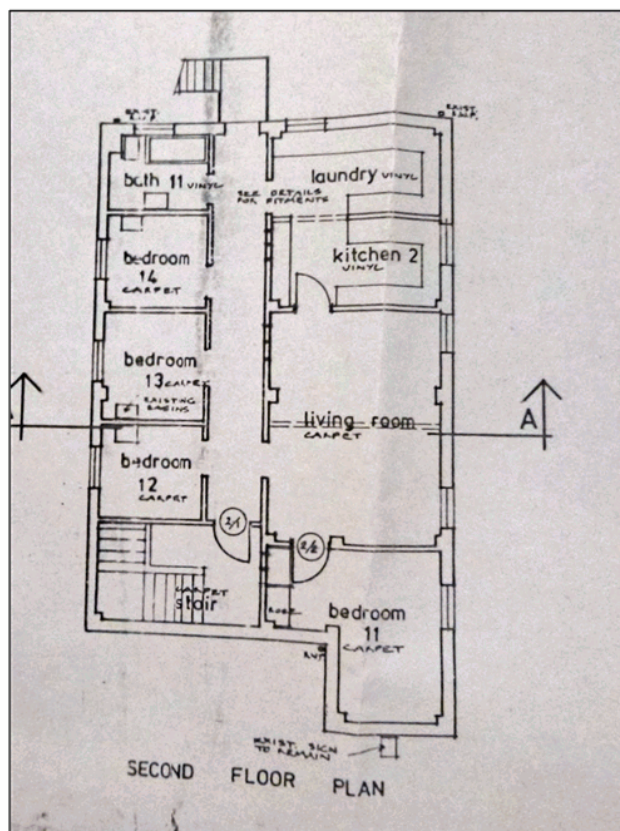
1973 plan for second floor alterations to the Freemasons Hotel. North to the right of the Figure (TAHO, AE417/5/2945, 58 Harrington Street, Cascade Brewery, Alterations (74053).
